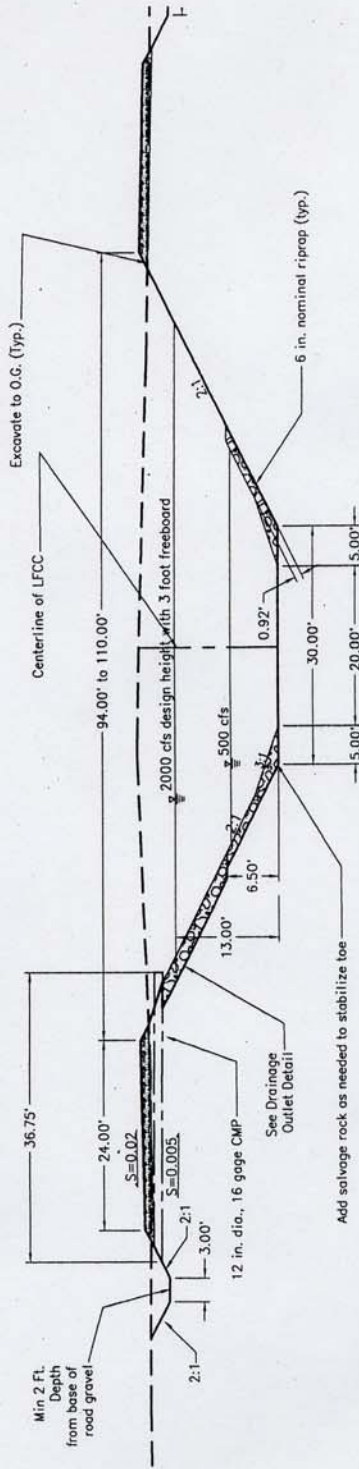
Typical RM 111 levee setback project cross section with drainage pipe. All dimensions are approximate.
